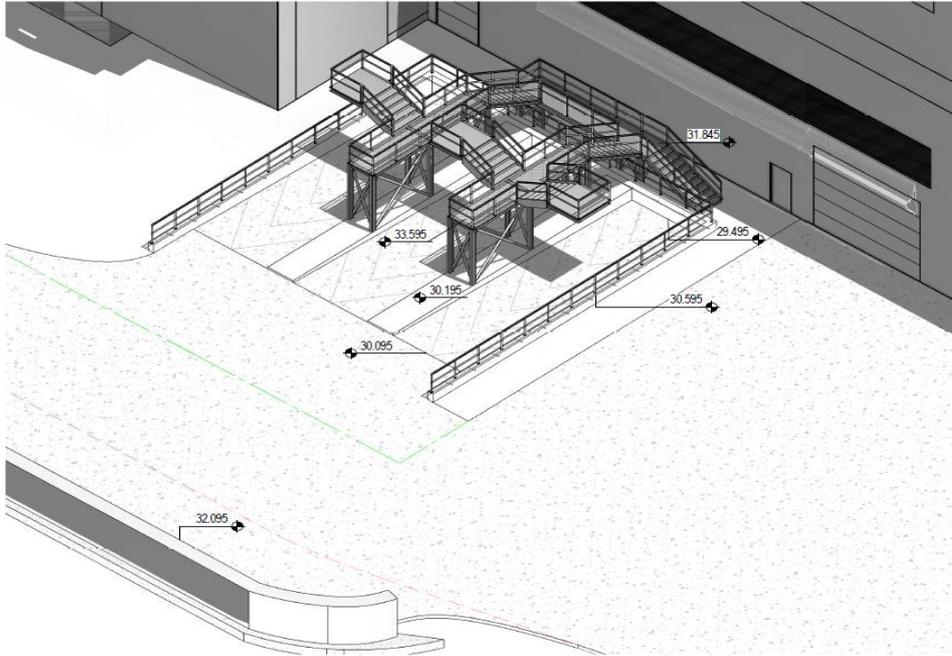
Proposed Upgrade to Existing Tanker Unloading area
